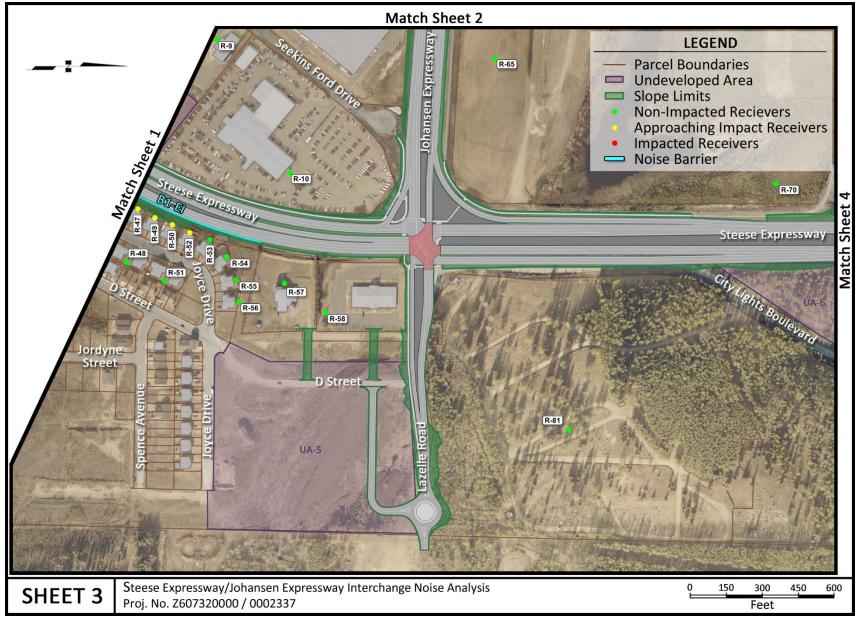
Echelon Interchange Noise Impacts and Proposed Barrier Walls, Sheet 3
